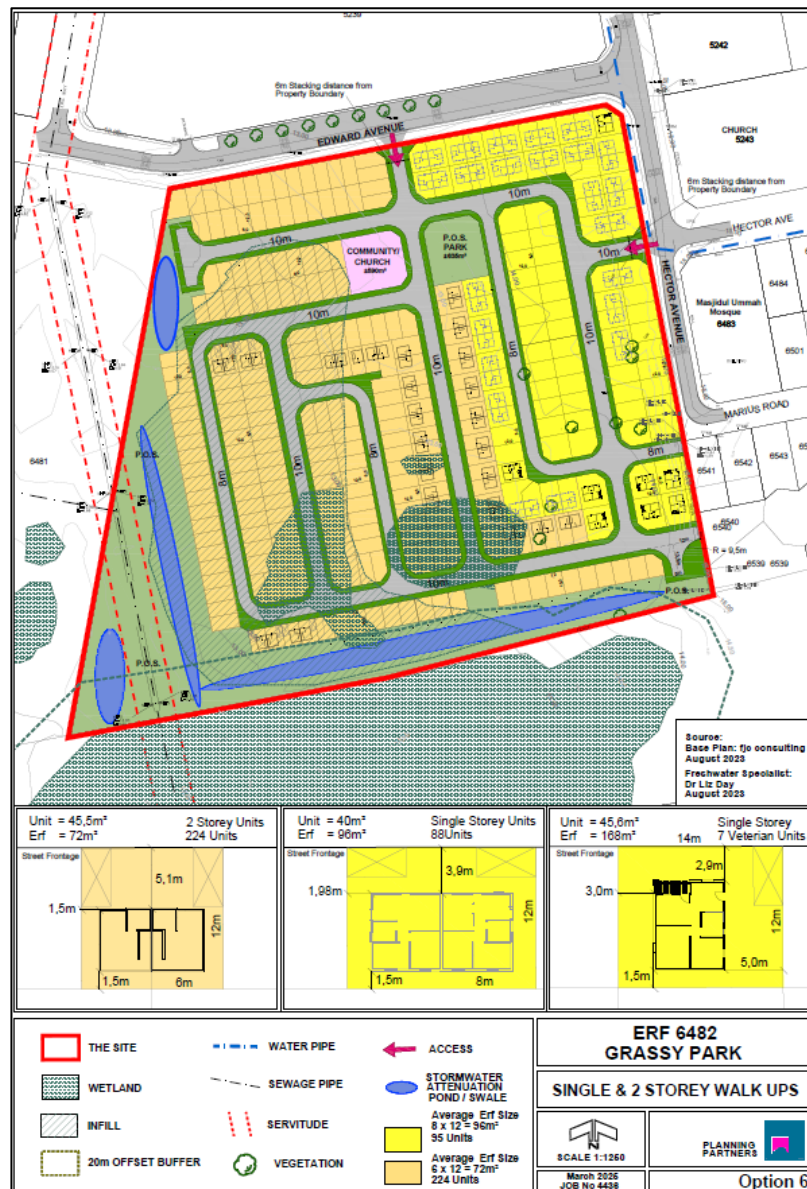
Alternative 1 Concept Development Plan (source: Planning Partners, 2025)
